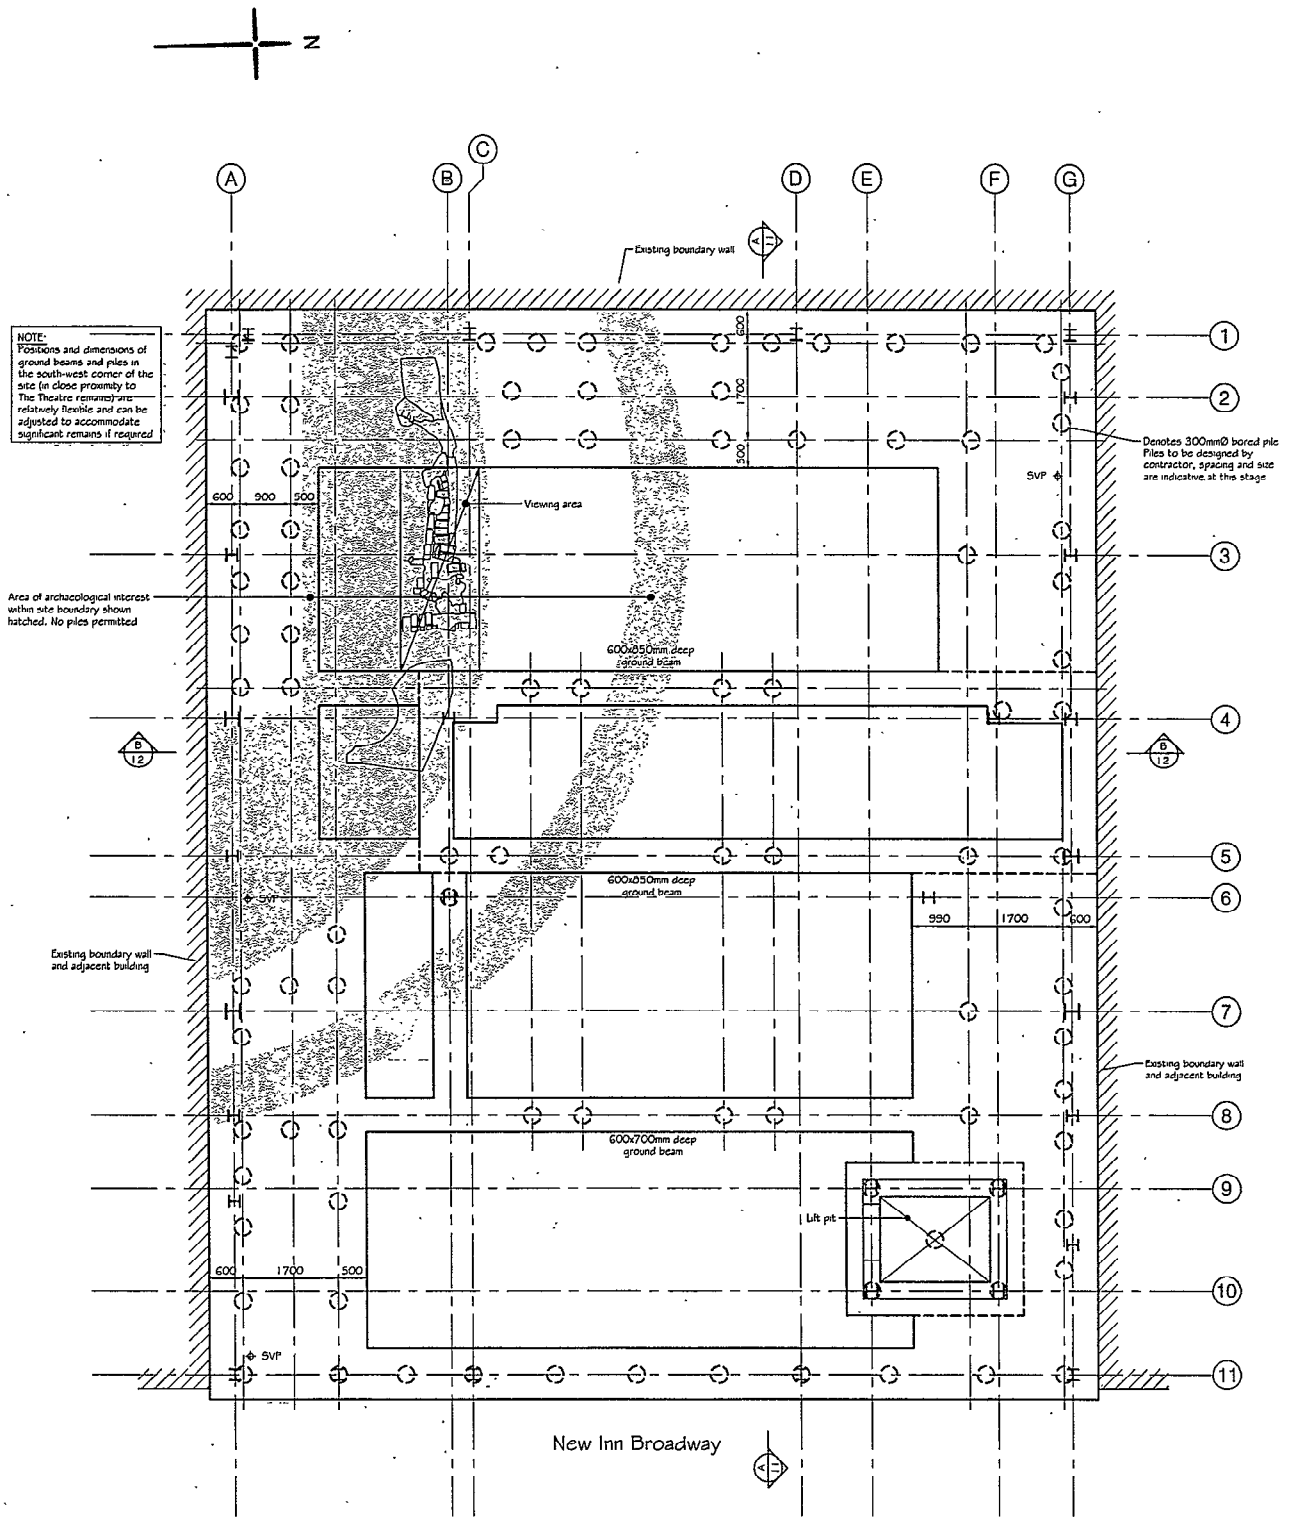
Preliminary pile and ground beam layout (Hannah Reed drawing no. C-208223/01 Rev P6, 18/05/09)
